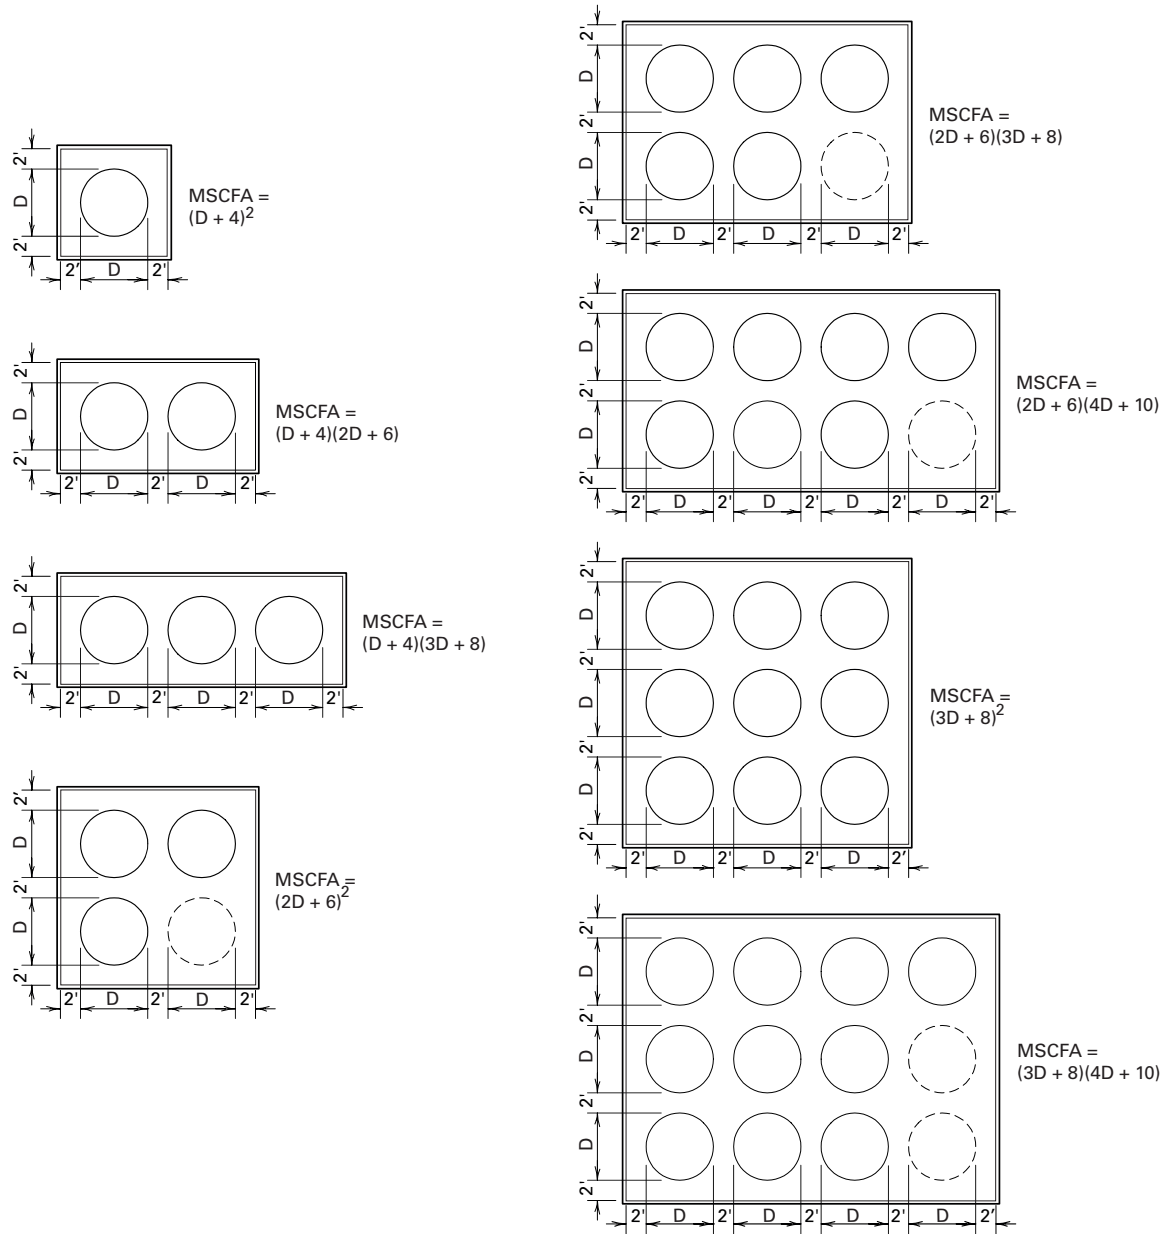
The minimum secondary containment floor area (MSCFA) required to provide space for the tanks and the required 2 feet between each tank and the 2 feet between a tank and walls for several common layouts with all vertical tanks of the same diameter.
